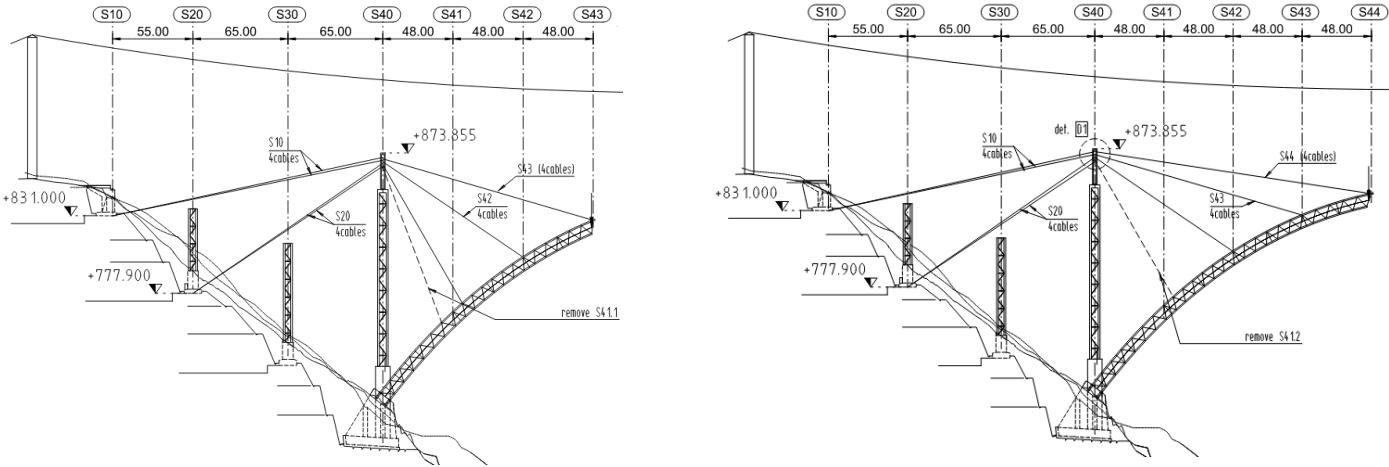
Uninstalling temporary stays S41.1 and S41.2 (similarly S49.1 and S49.2 on Kauri side)
